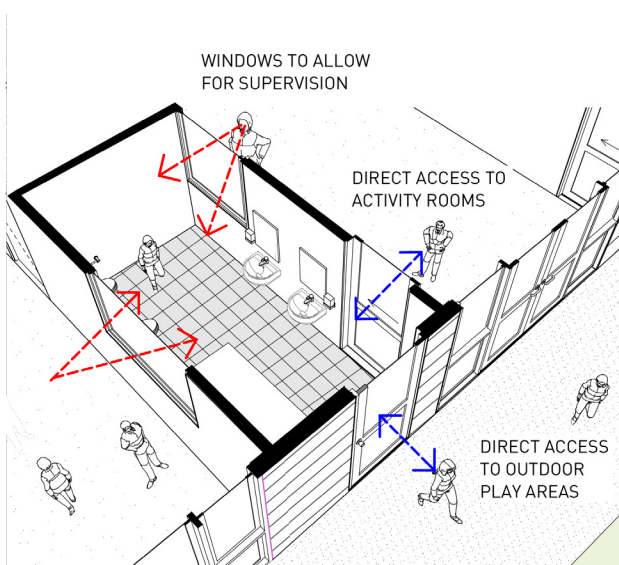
Bathroom facilities to have direct access to outdoor areas and activity rooms. Supervision requirements need to be considered in the design to prevent blind spots.
